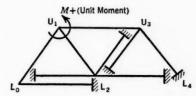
MEMBER GROUP, AIRPLANE TRUSS
